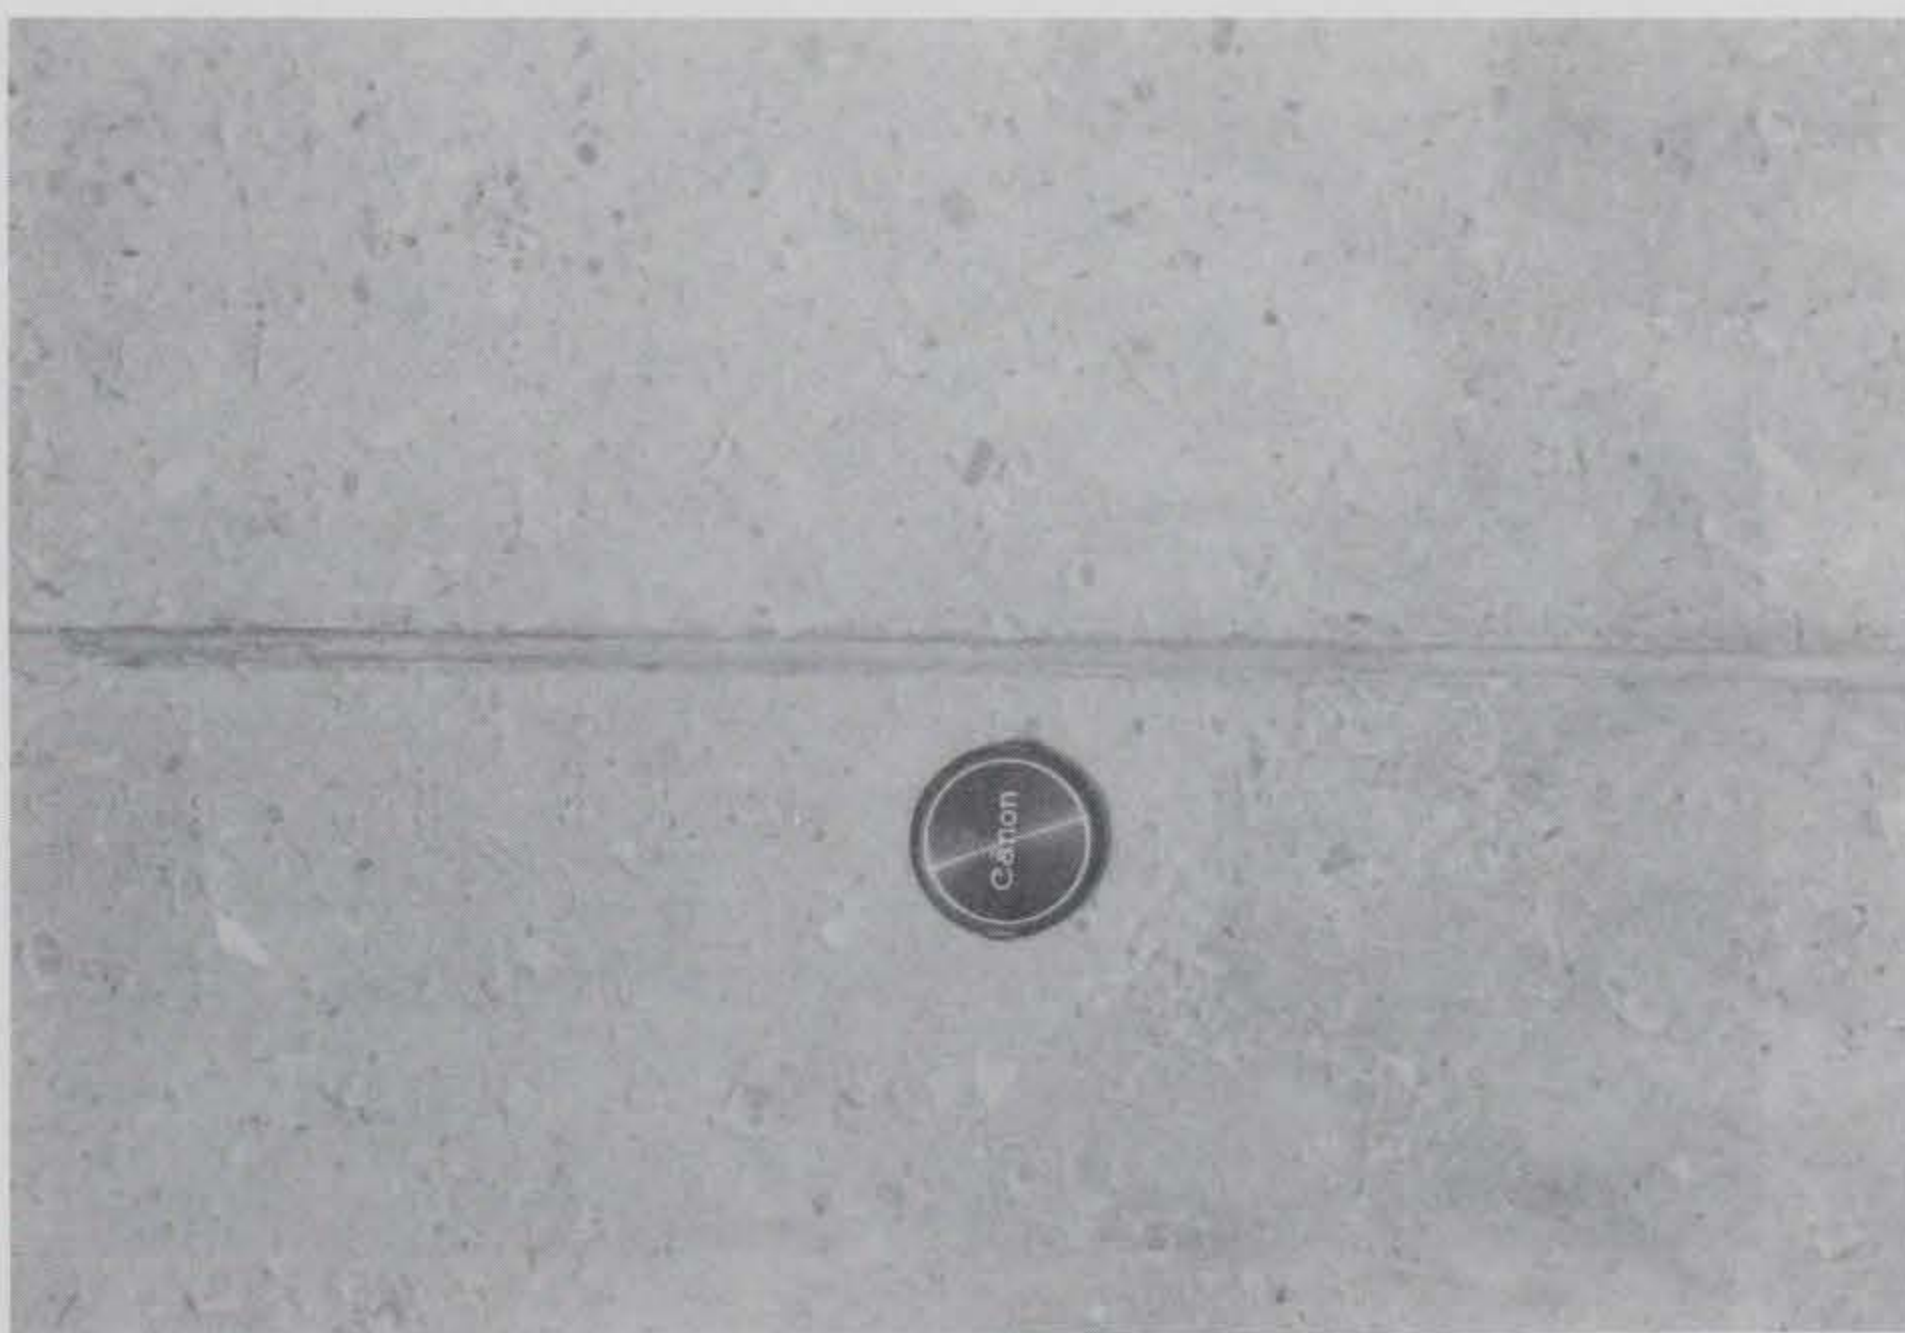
The transverse contraction joints and cold joints were sealed with an asphaltic joint sealer
